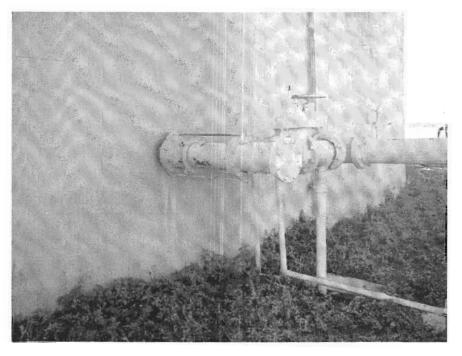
View of tank drain line wall penetrations in outer tank wall – no leaks or defects noted.
